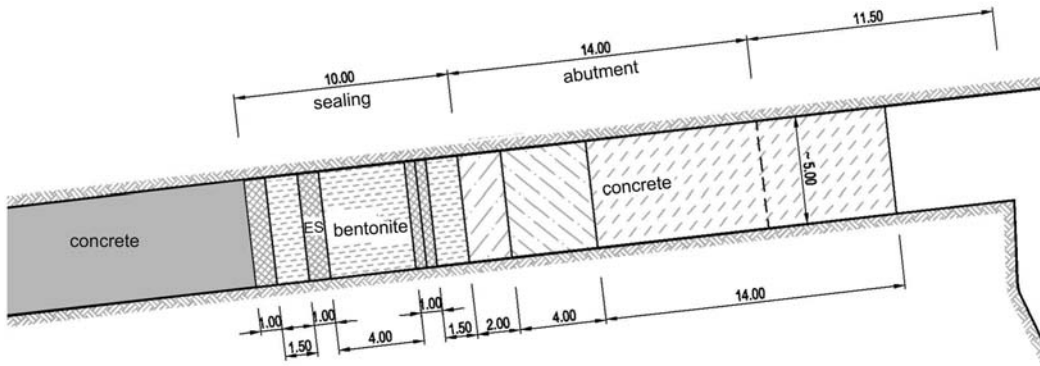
Construction of the layered replacement for dam 71 in the gallery showing the abutments and the SANDWICH between them.
